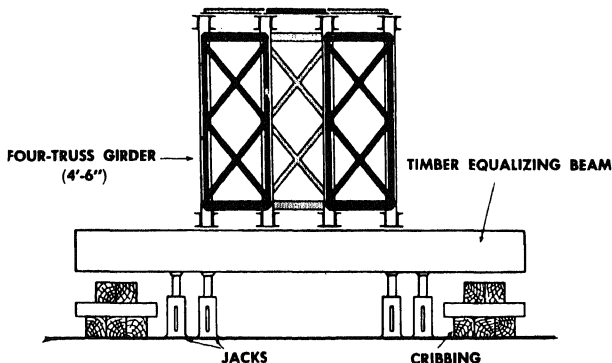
Jacks under four-truss girder using equalizing beam.
